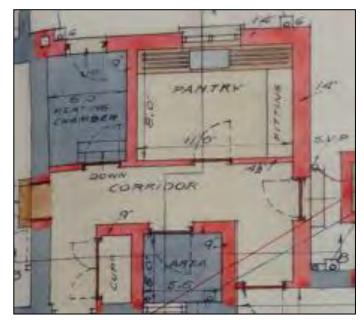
Extract from the 1929 plan showing Rooms 3, 13 and 14 (BARS ref: RDB P 1/1314)
